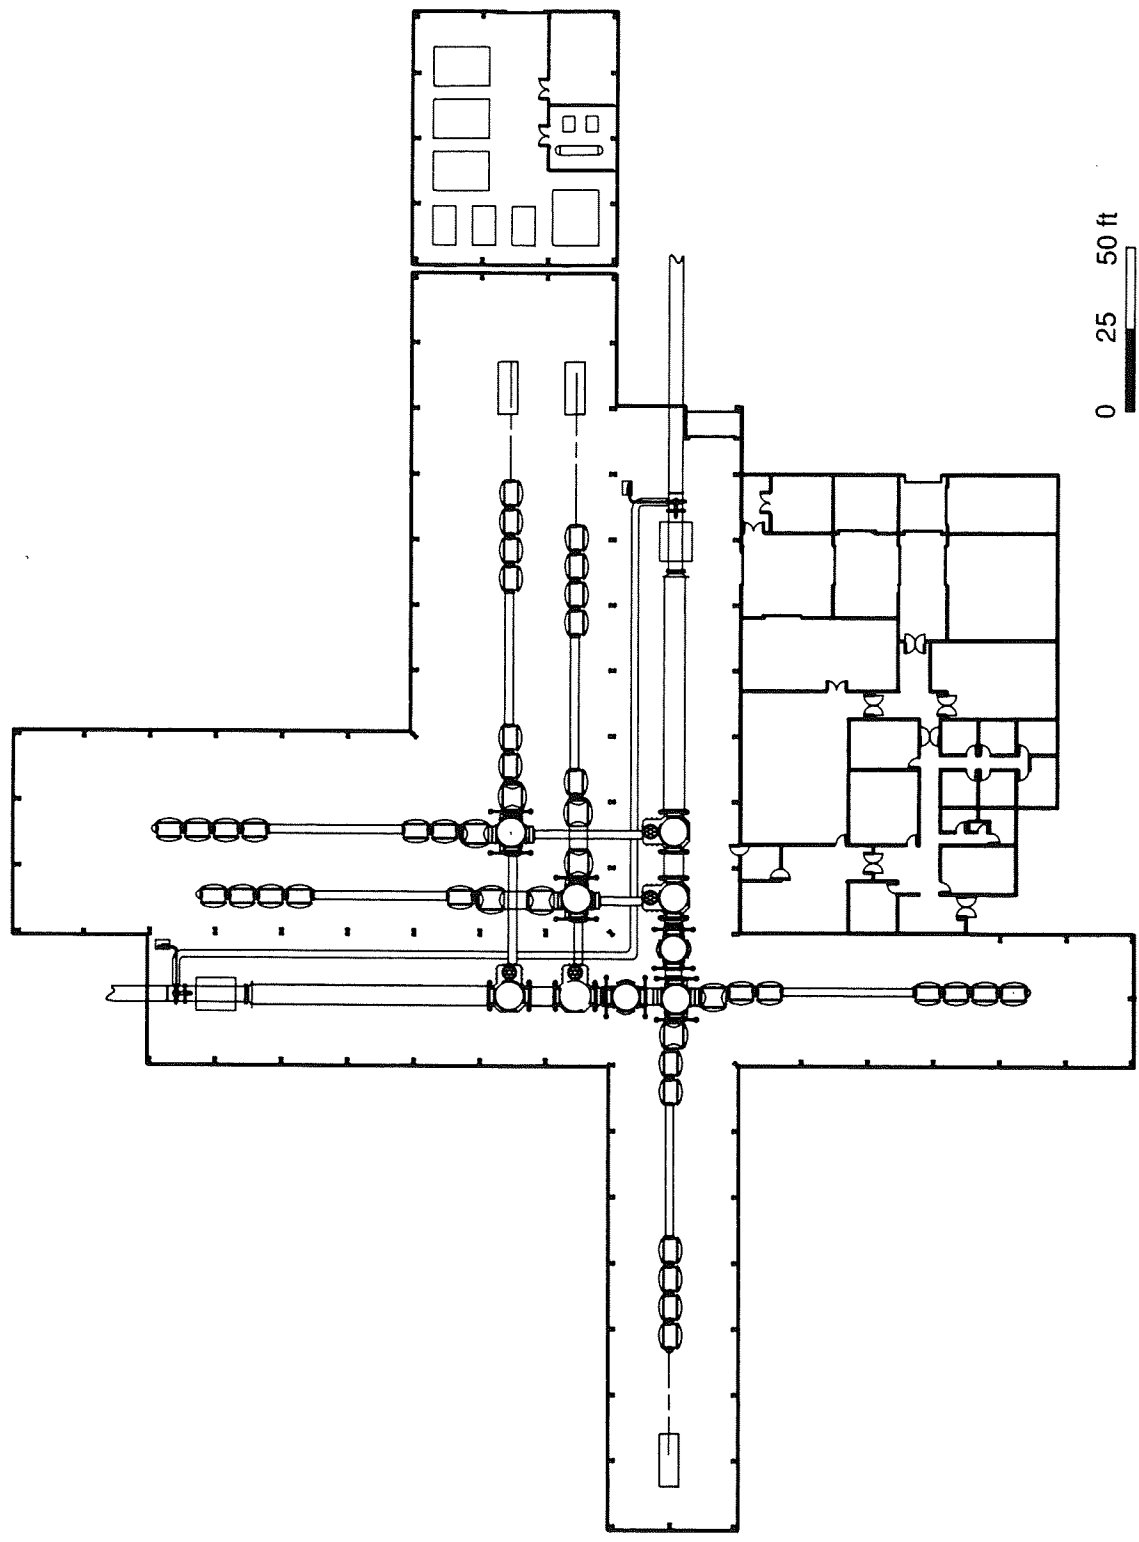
Floor plan for the Site 2 corner station in Phase C.
